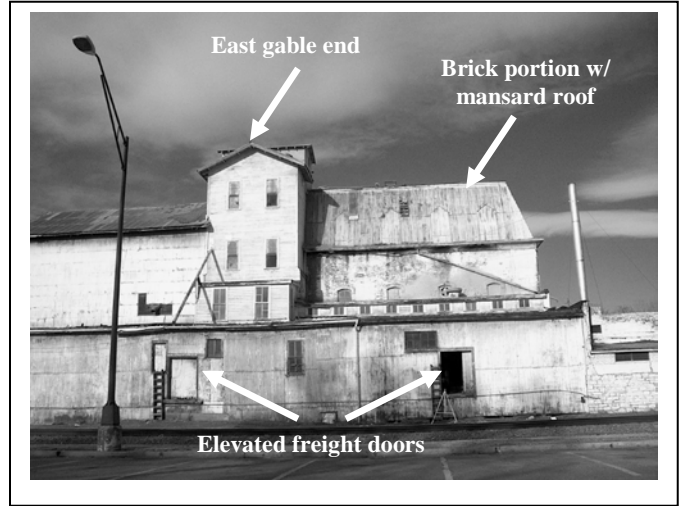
Wood-sided east facing gable, and brick portion of structure covered w/mansard roof.
